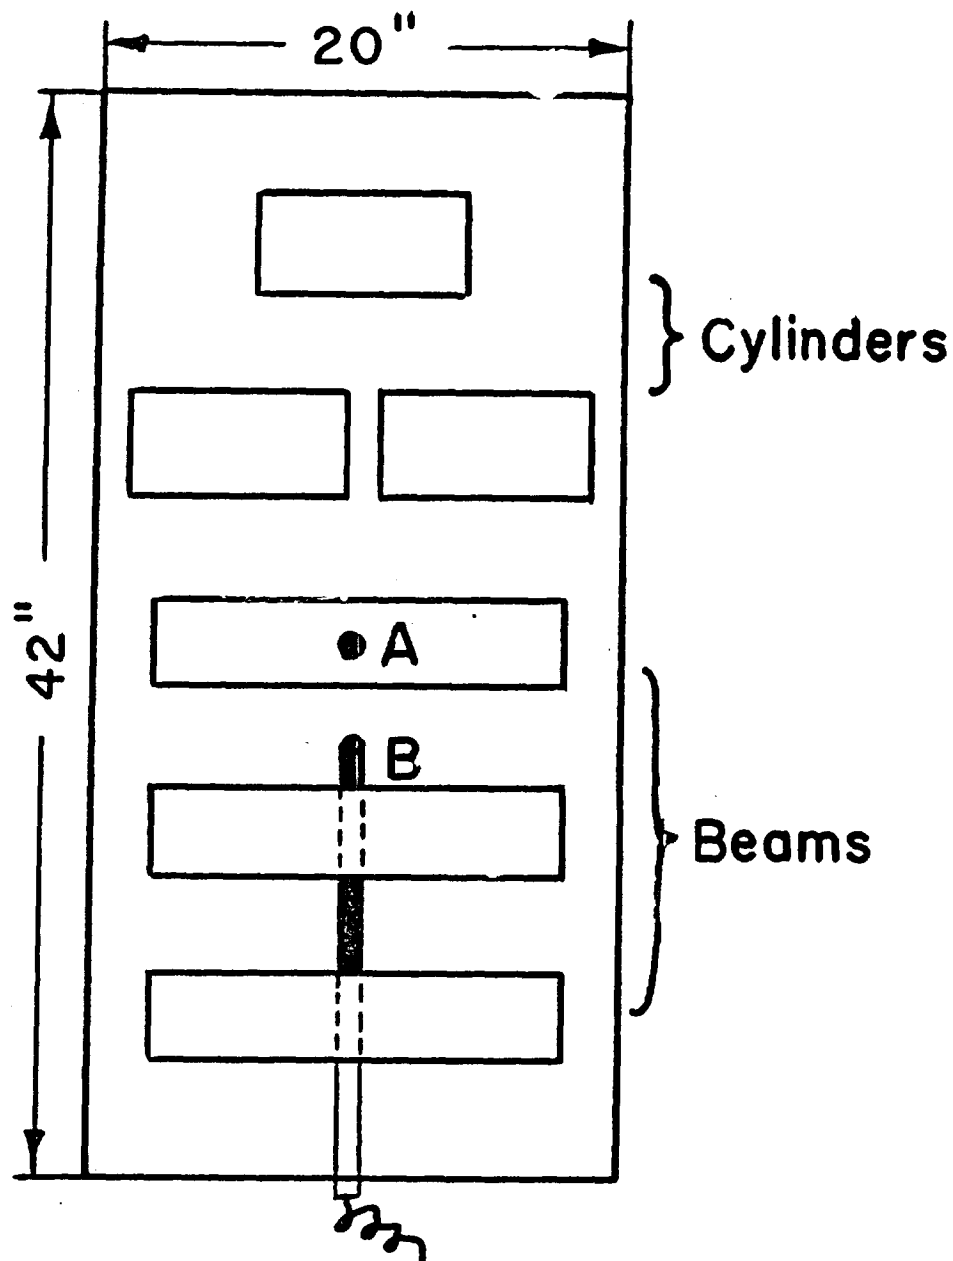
Arrangement of Test Specimens in Furnace. (Plan)
